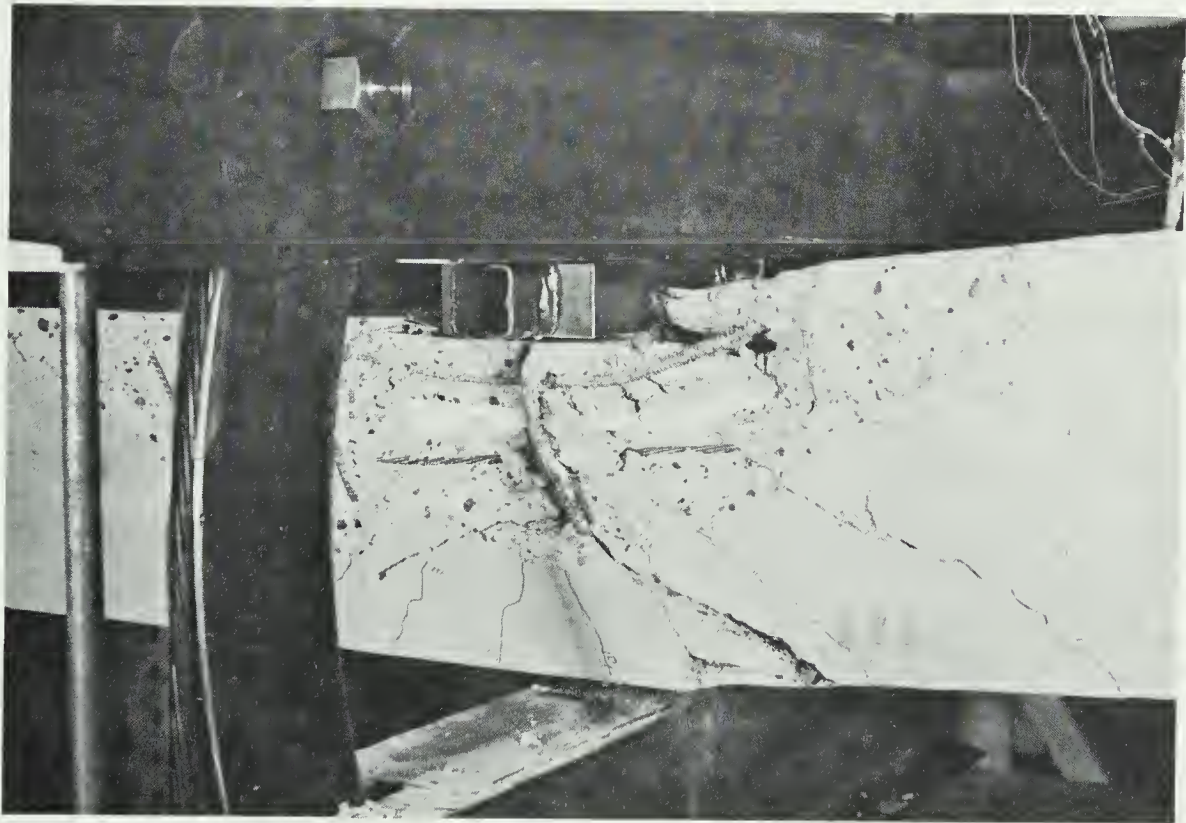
LOCAL FAILURE OF BEAM T1
